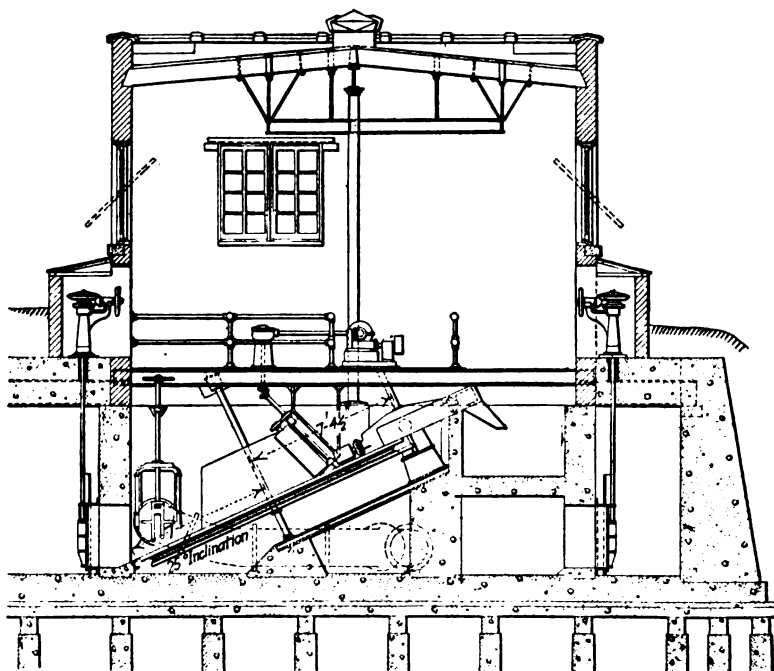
Sectional elevation of Brooklyn screen chamber. (Section taken on line BB of Fig. 75.)
